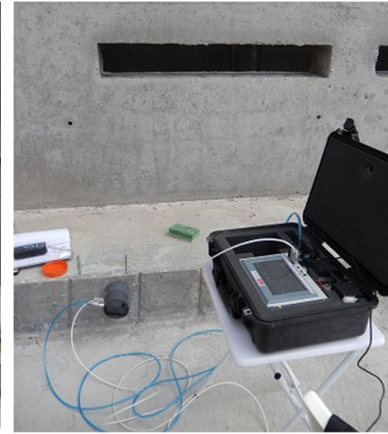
View of Internal Wall 1, Foundation Slabs 1 and 2 and Foundation Beam
